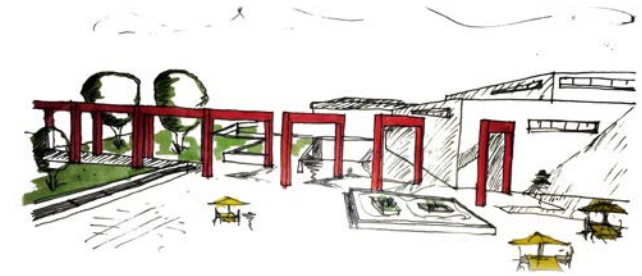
Courtyard space sketch 1 (Author 2018)
